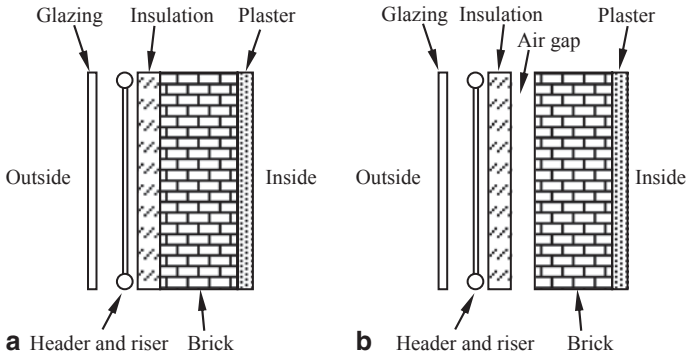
Two solutions of façade building-integrated flat plate collectors. a Solar thermal system (STS) adjacent to the brick. b STS with air gap
